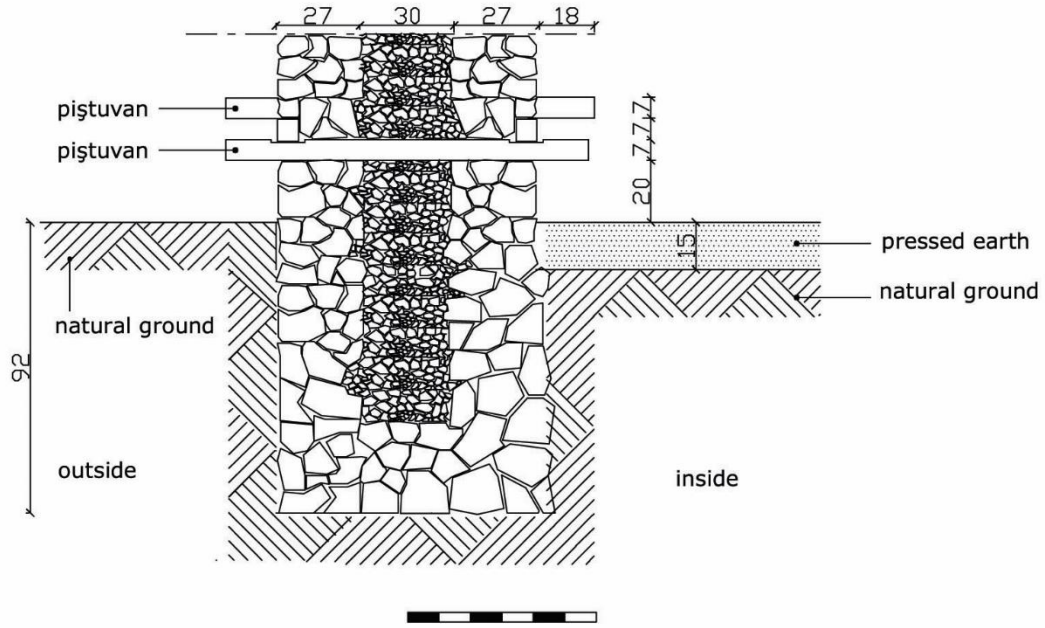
Drawing of the Foundation Type B (Çelik 2009)
